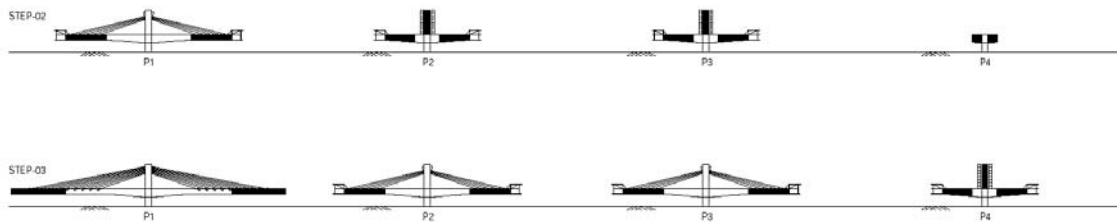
Bridge Deck Expanding with Form Traveler (in-situ)
